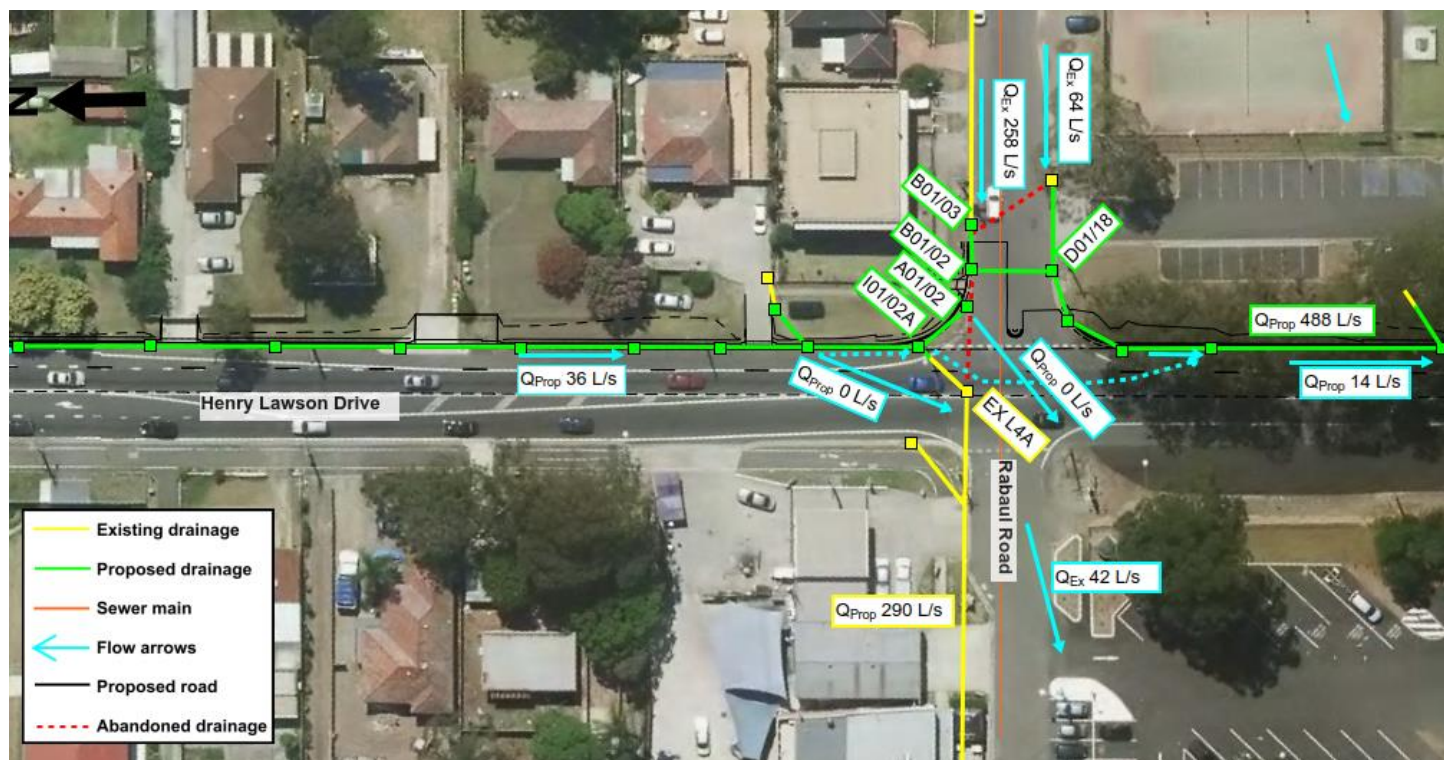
Henry Lawson Drive and Rabaul Road intersection proposed network
